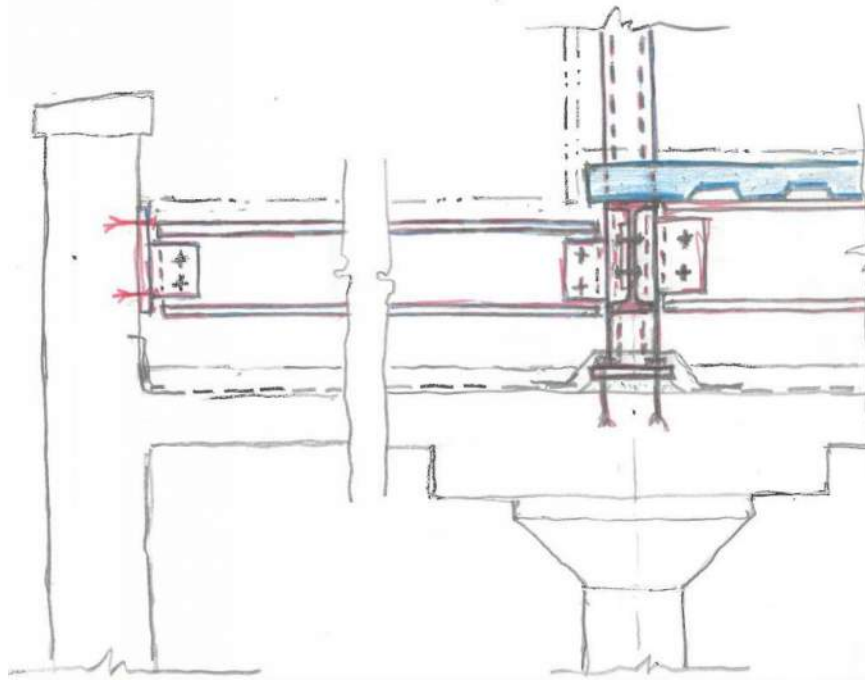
Typical Section at Raised Floor of Rooftop Addition and Perimeter Terrace
